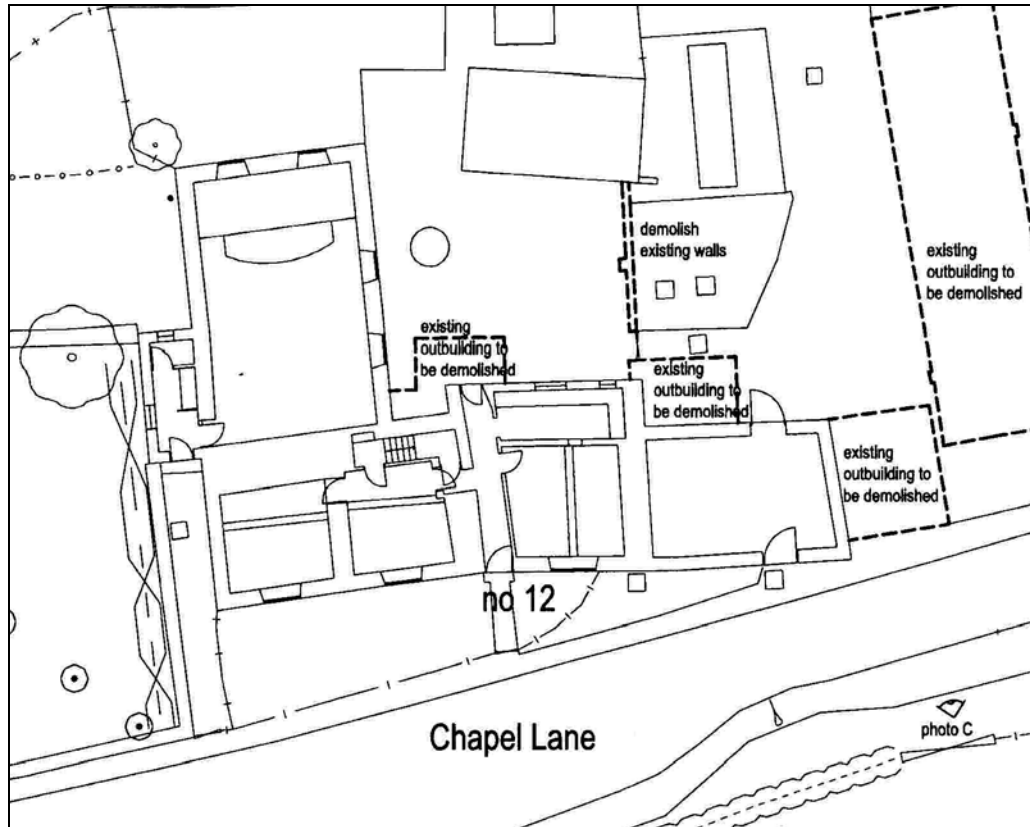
Plan of site. Based on plans supplied by the client, not to scale
